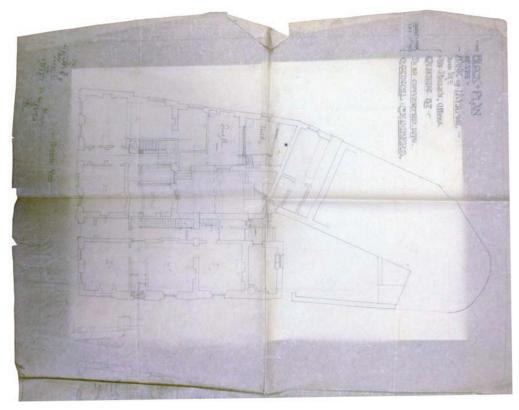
Ground floor plan of bank and offices to be converted to council chambers, dated 1901 (CAC(B) Z/1028/2 1901-1904)
